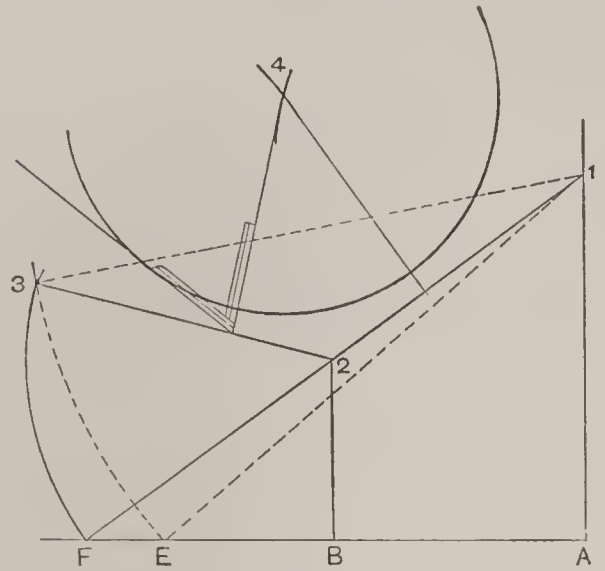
ELEVATION, BEVEL AND TANGENTS OF ONE PITCH, TO COVER GROUND PLAN OF FIG. 152.
